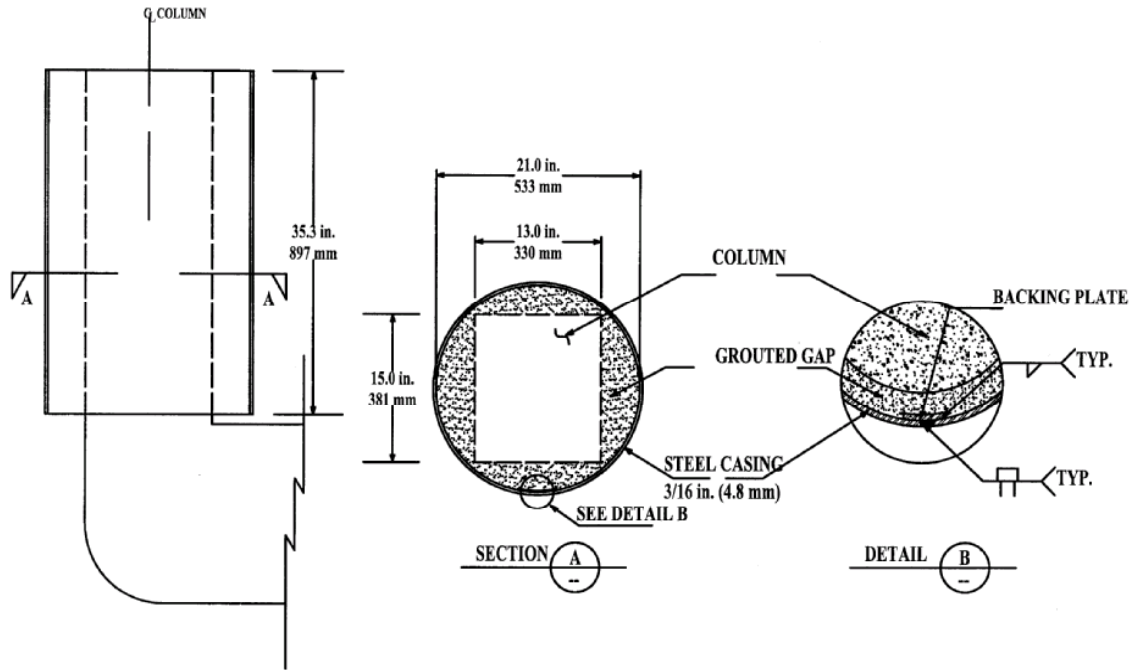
As-Built Long Outrigger Column Steel Jacket Retrofit Details
